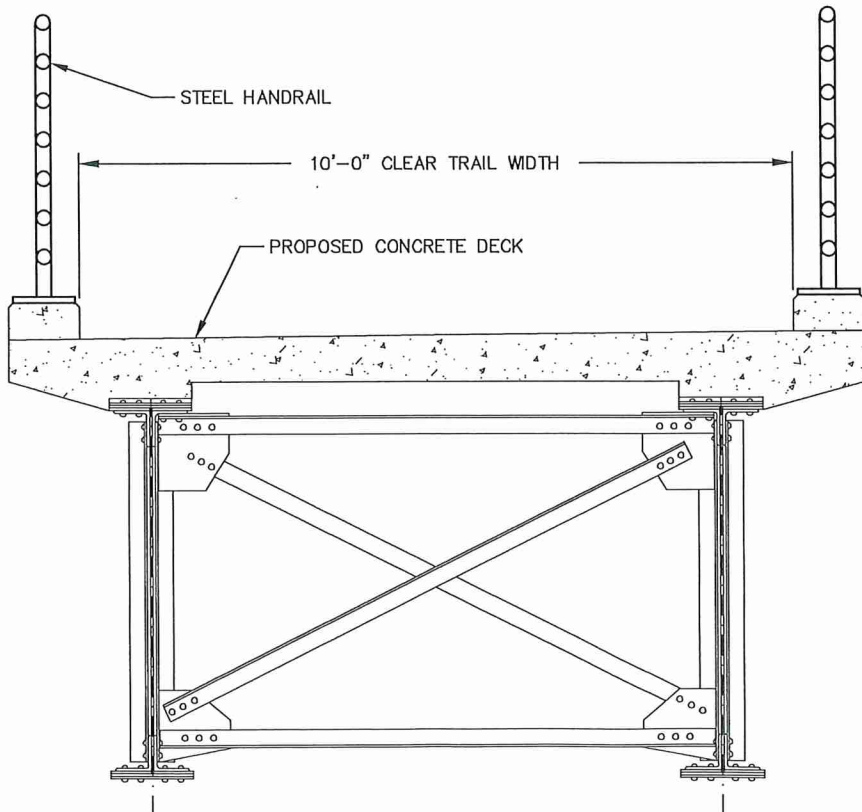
CONCRETE DECK FOR STEEL SPANS (OPTION 2)
